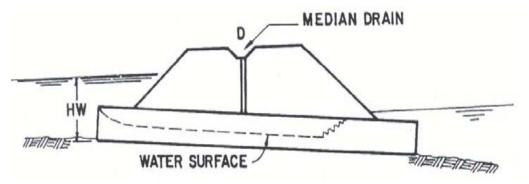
Inlet and Outlet Submerged [Source: FHWA, 2005].
